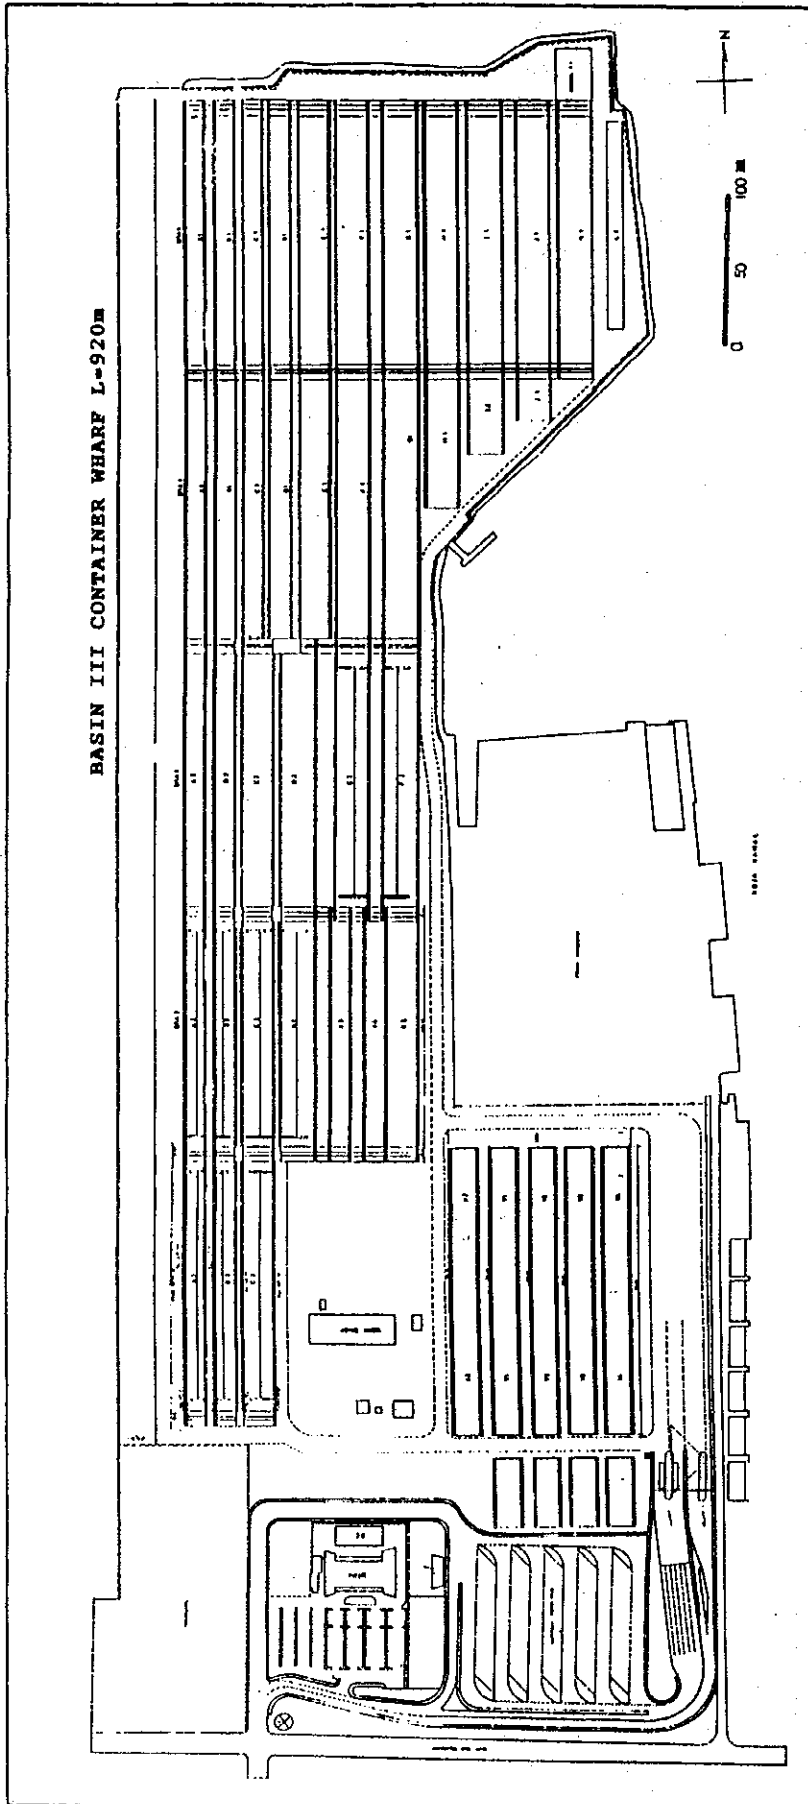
General Layout Plan of Container Terminal (CTI) Port of Tanjung Priok
